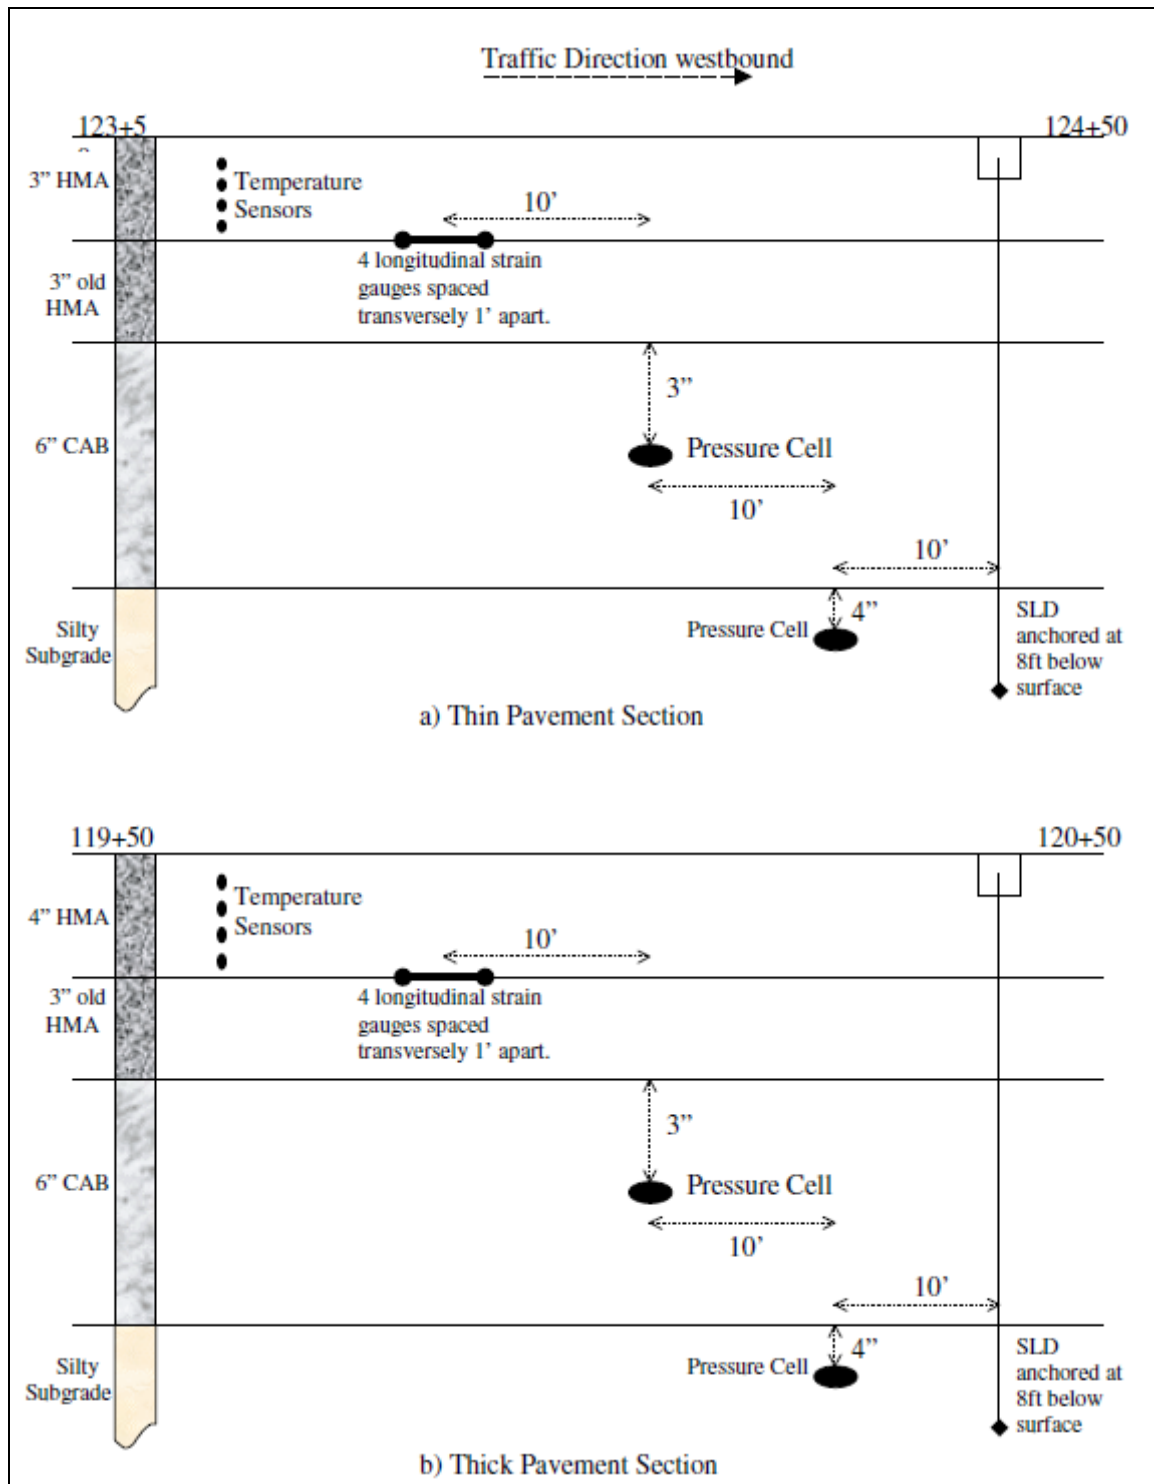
Layout of Instrumentation on SD26 Sections (Sebaaly, 2002)
